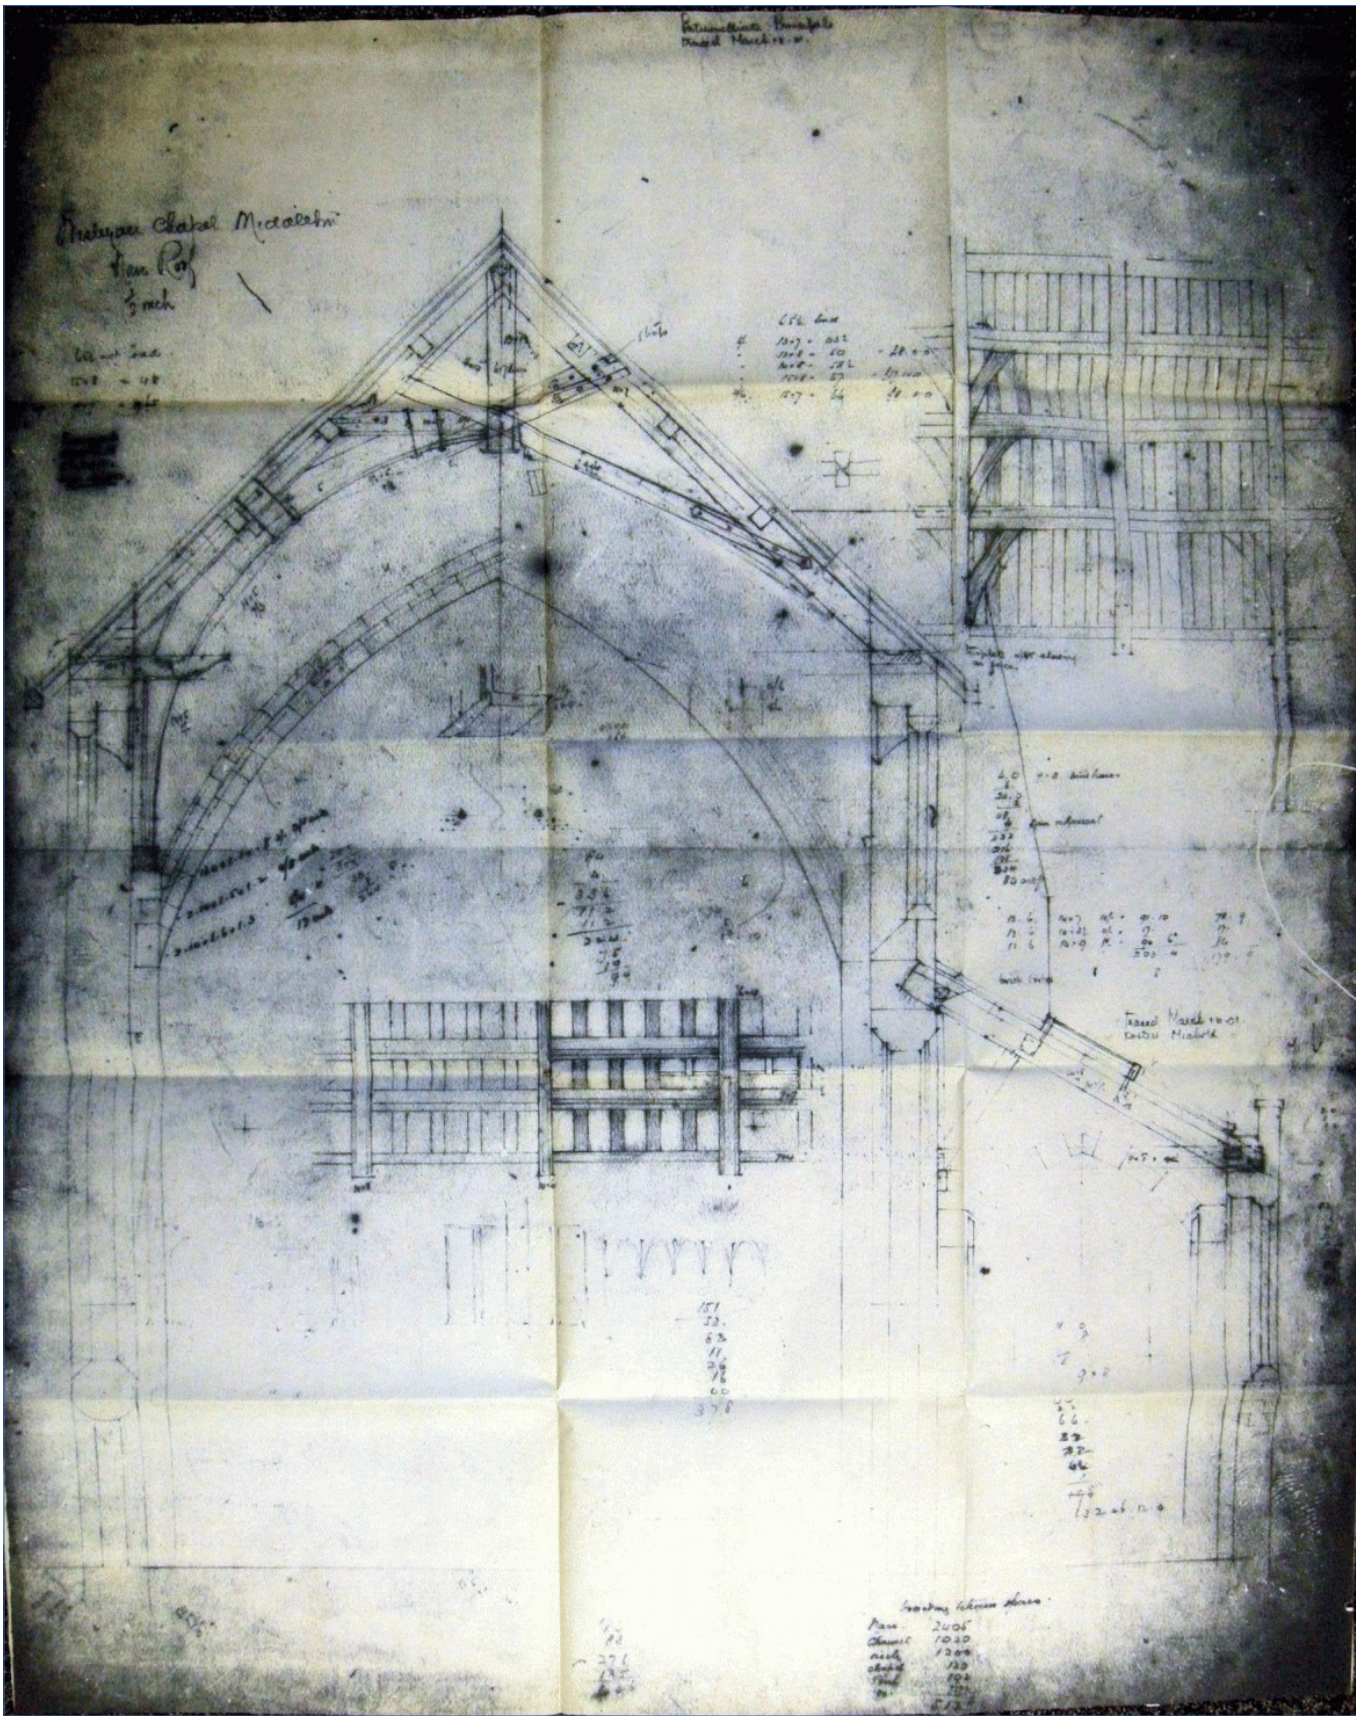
Detailed Drawing 1 - Church Roof Structure
